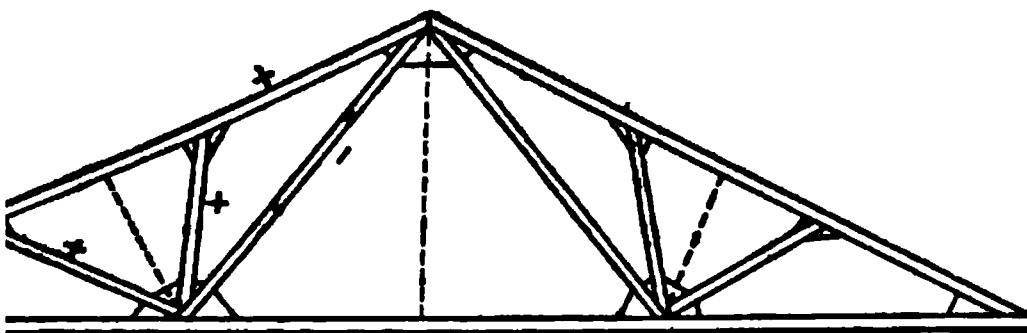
Fan Truss. Spans from Thirty-six to Fifty Feet
